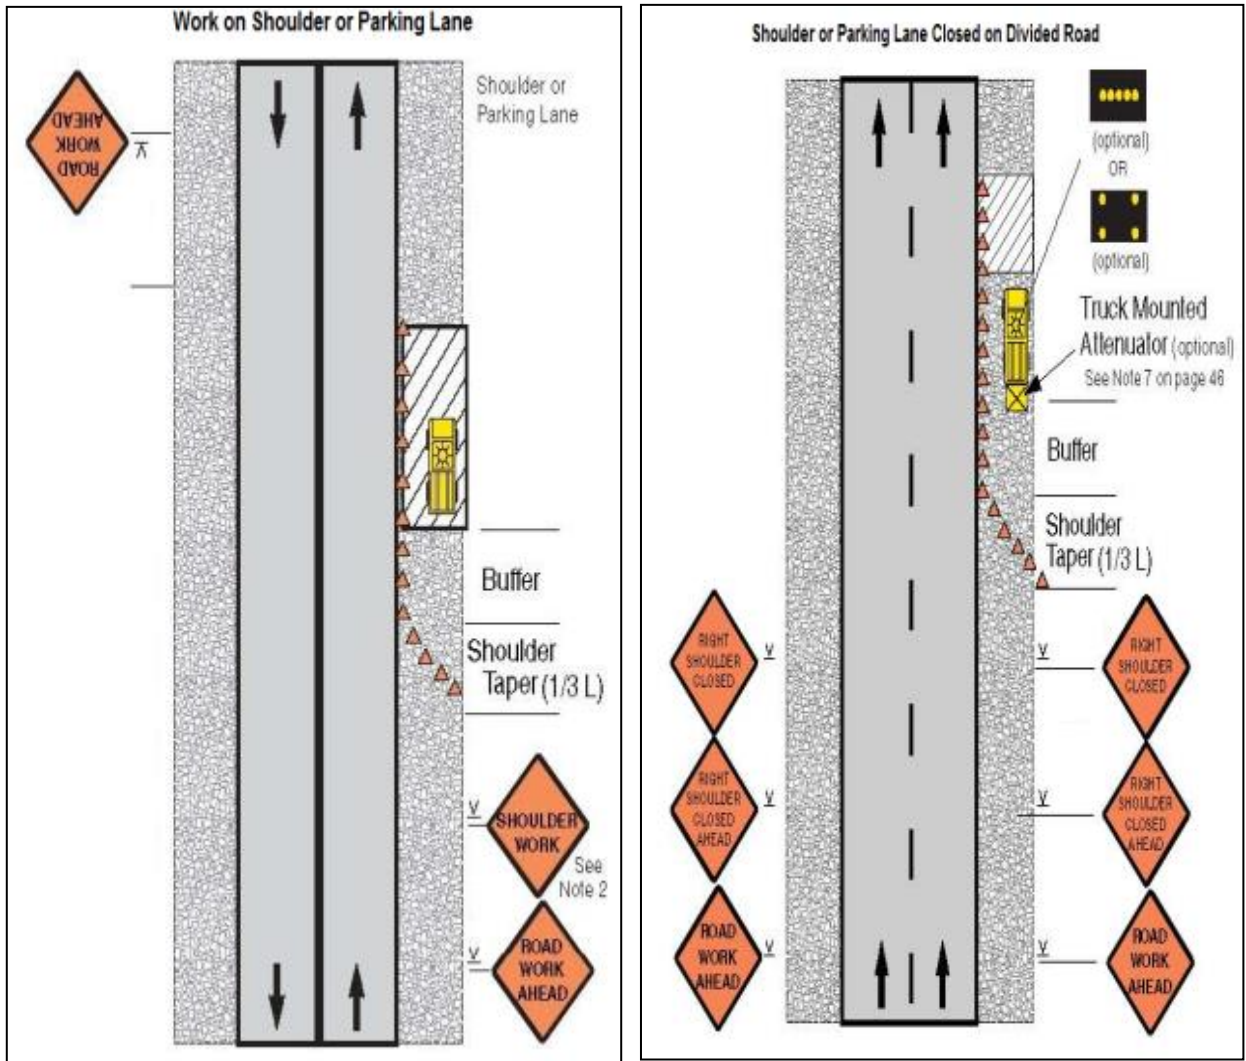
& A3: Work on shoulder or parking lane and shoulder or parking lane closed on divided road
